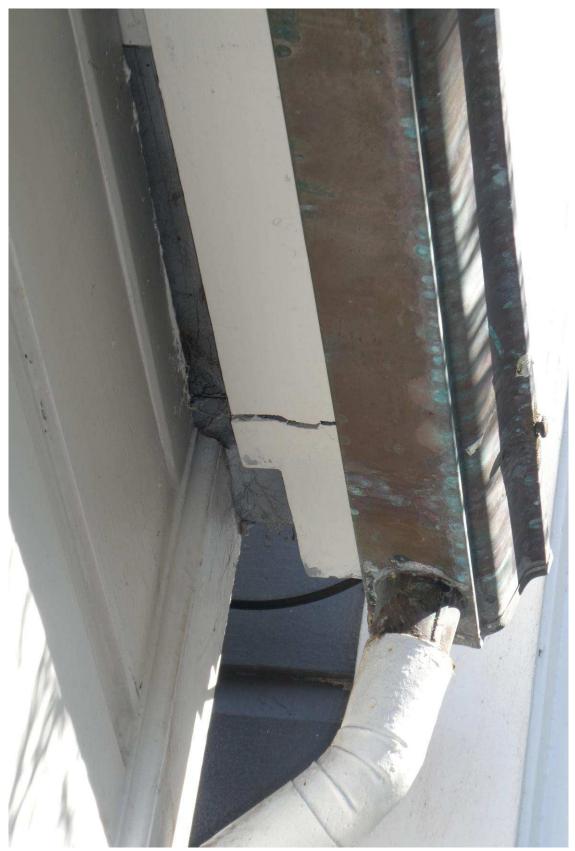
Detail showing the split/damaged wood at the southeast side of the first floor kitchen.
